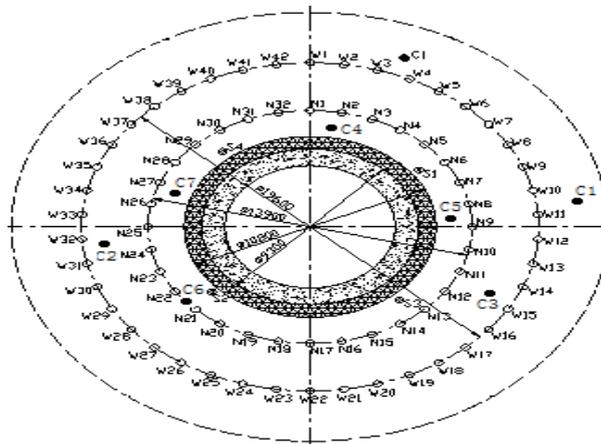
Layout of Auxiliary Shaft Frozen Hole
